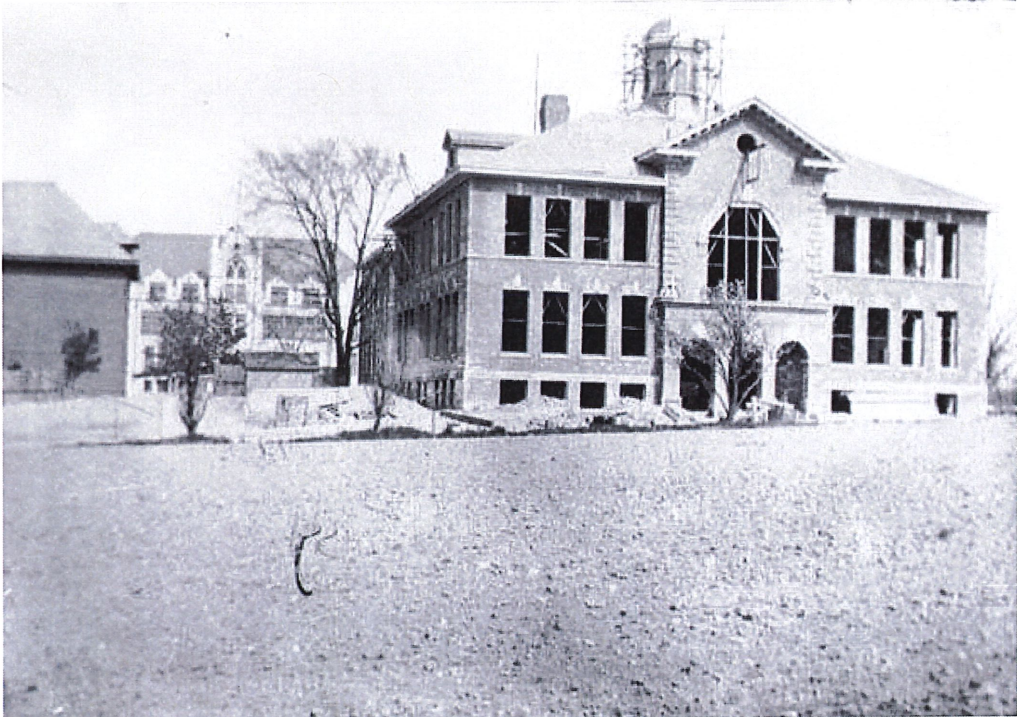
1904 construction photo showing West elevation of Grant School addition.
